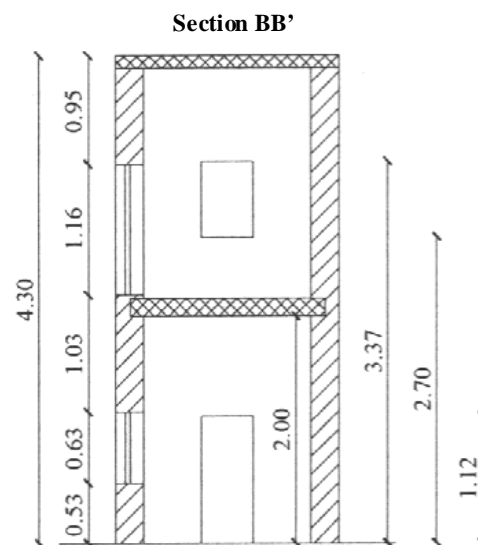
Cross-section B-B' of the masonry prototype (dimensions in m)
